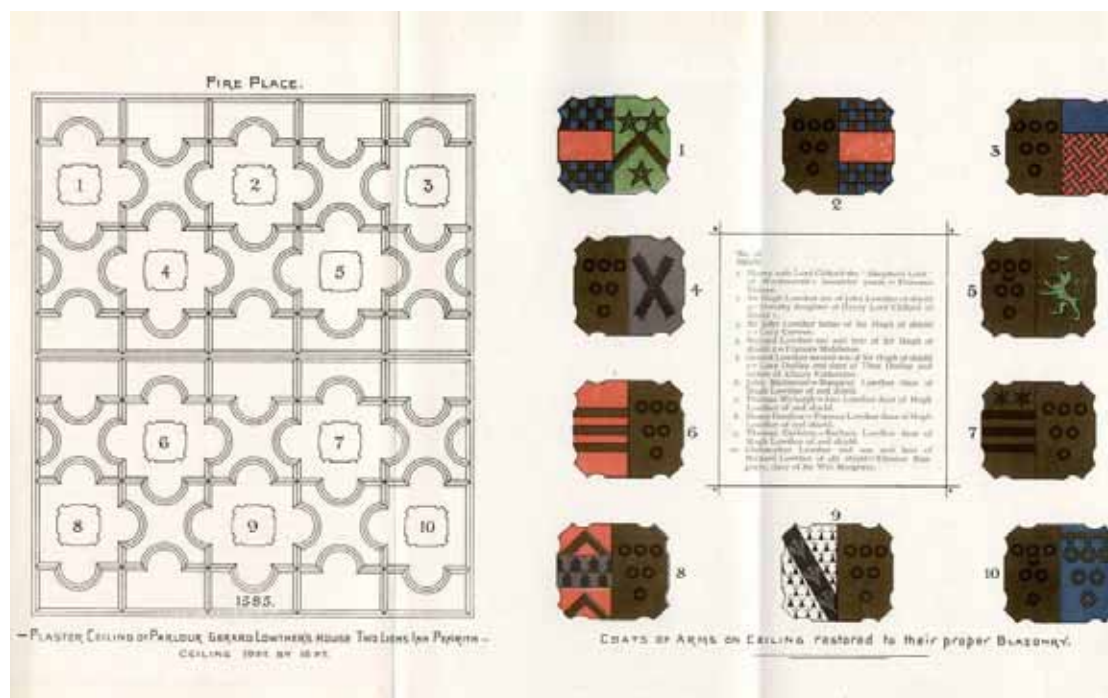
Plan of the ceiling and coats of arms (after Watson 1901)
